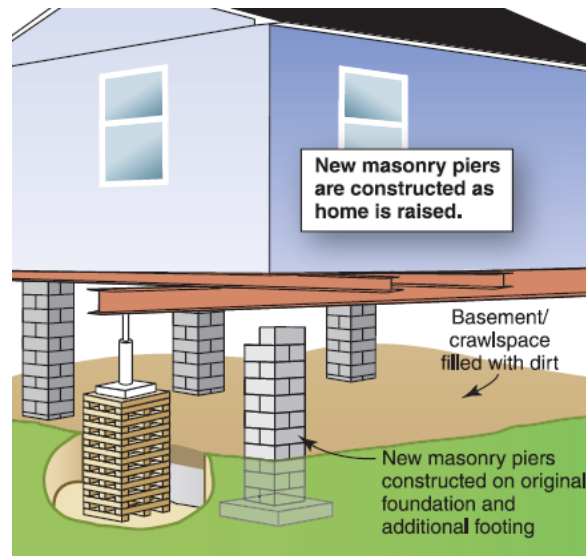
New masonry piers are then installed to support the raised home (FEMA)
